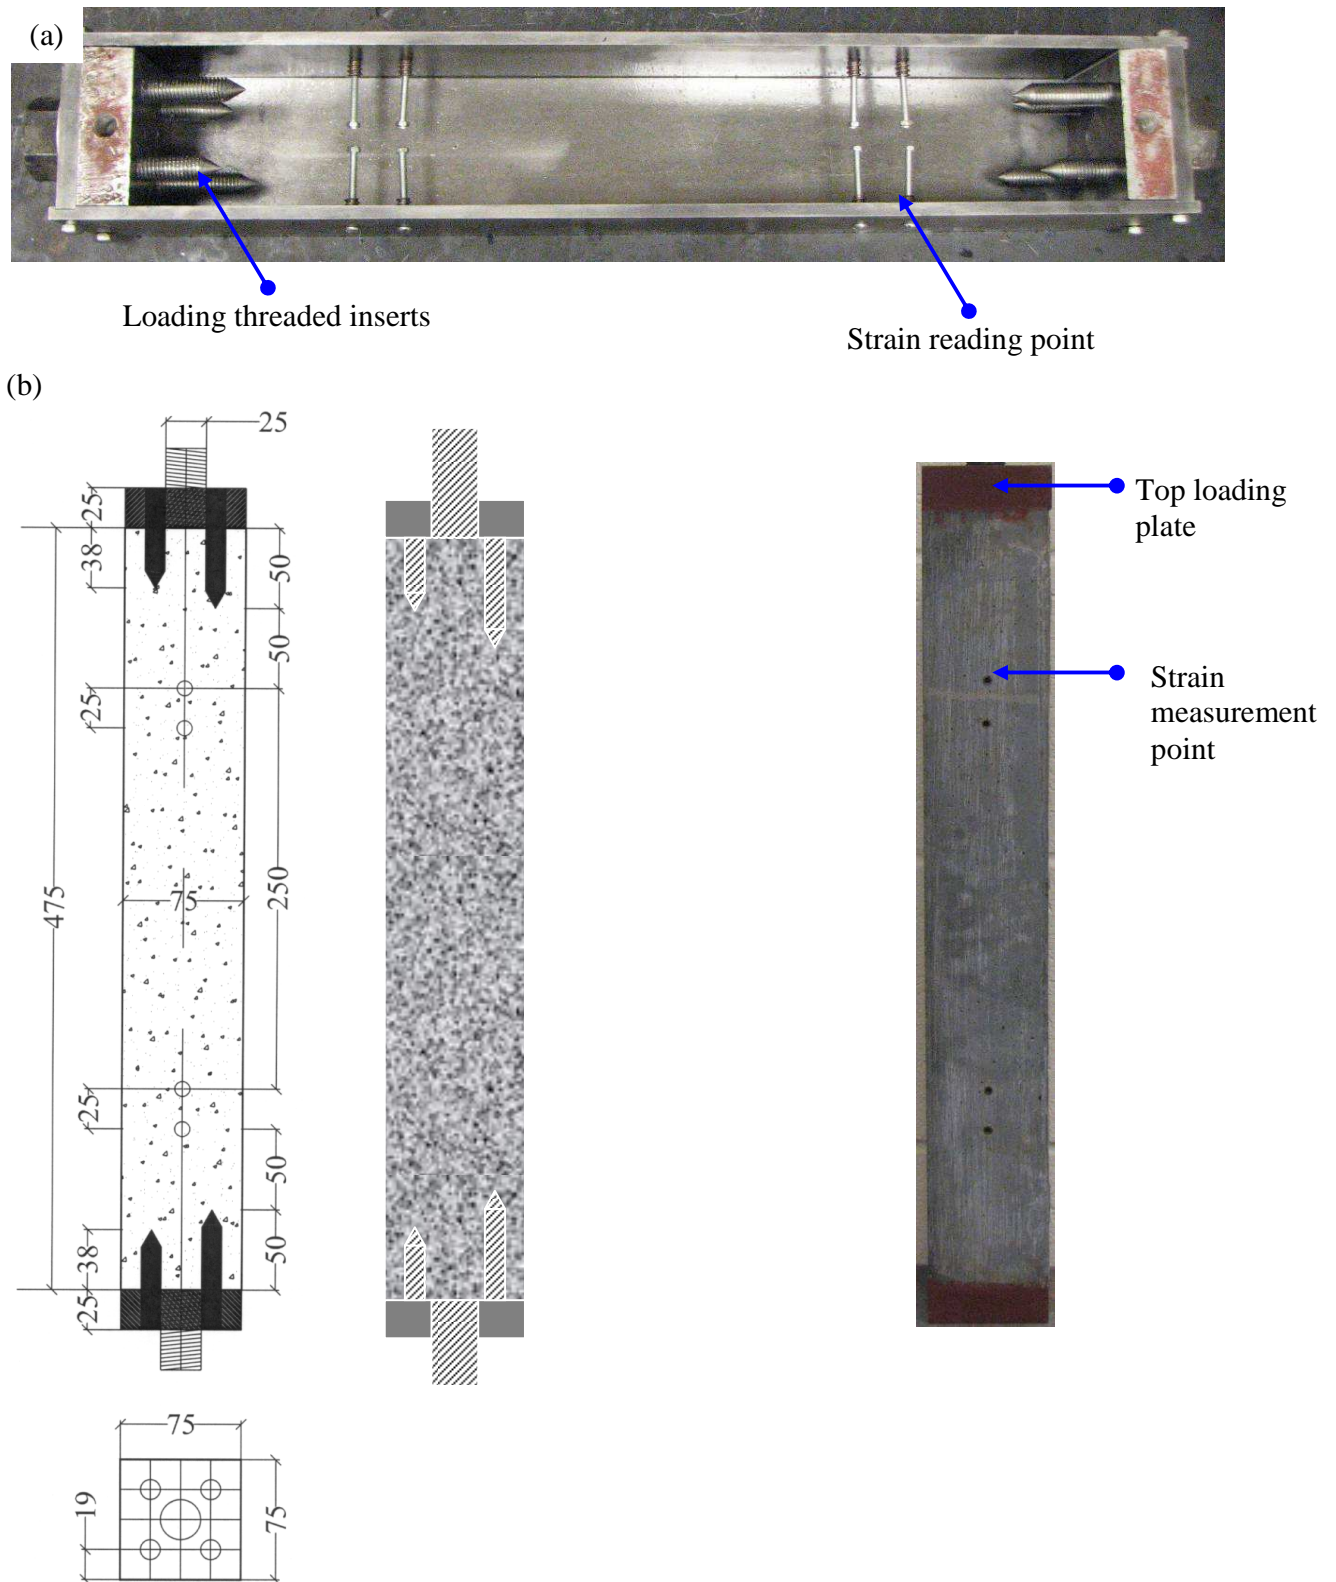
Tensile creep test specimen: (a) specimens mold and (b) specimen dimensions (mm)
